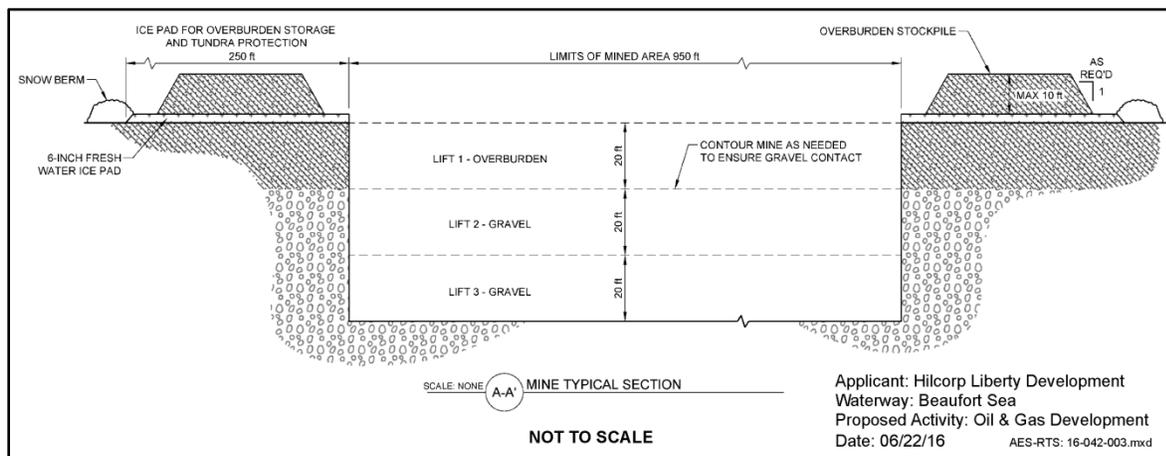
Proposed Action Mine Site Cross Section.
